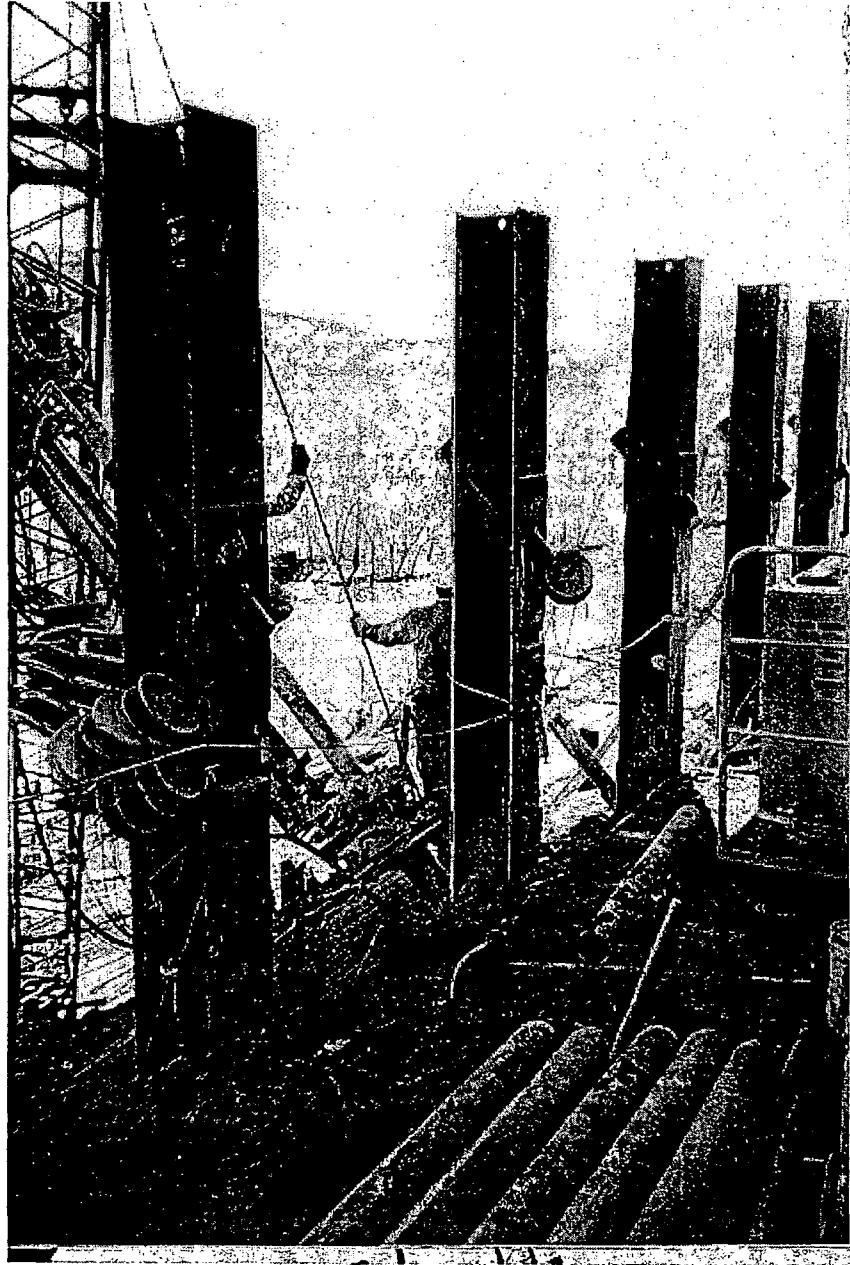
Drilling an anchor hole in the upper tier wall.
